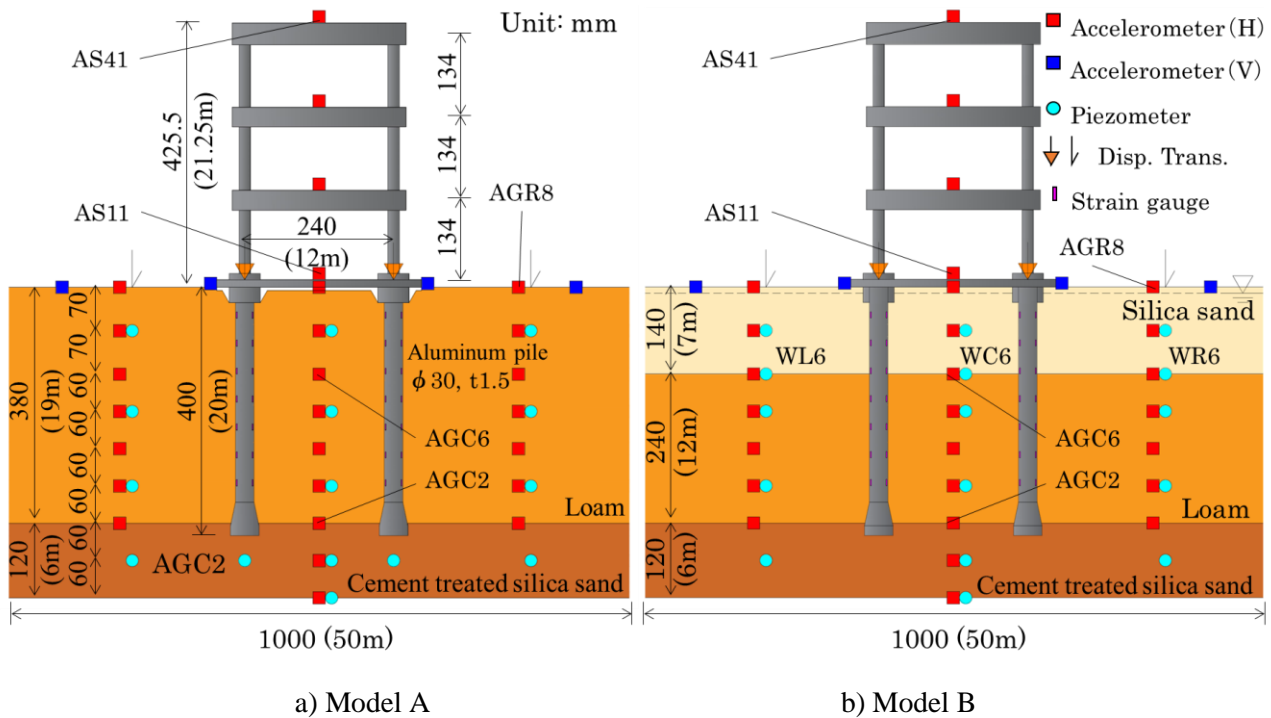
Schematic diagrams of centrifugal model using plate-shape building and pile foundation
